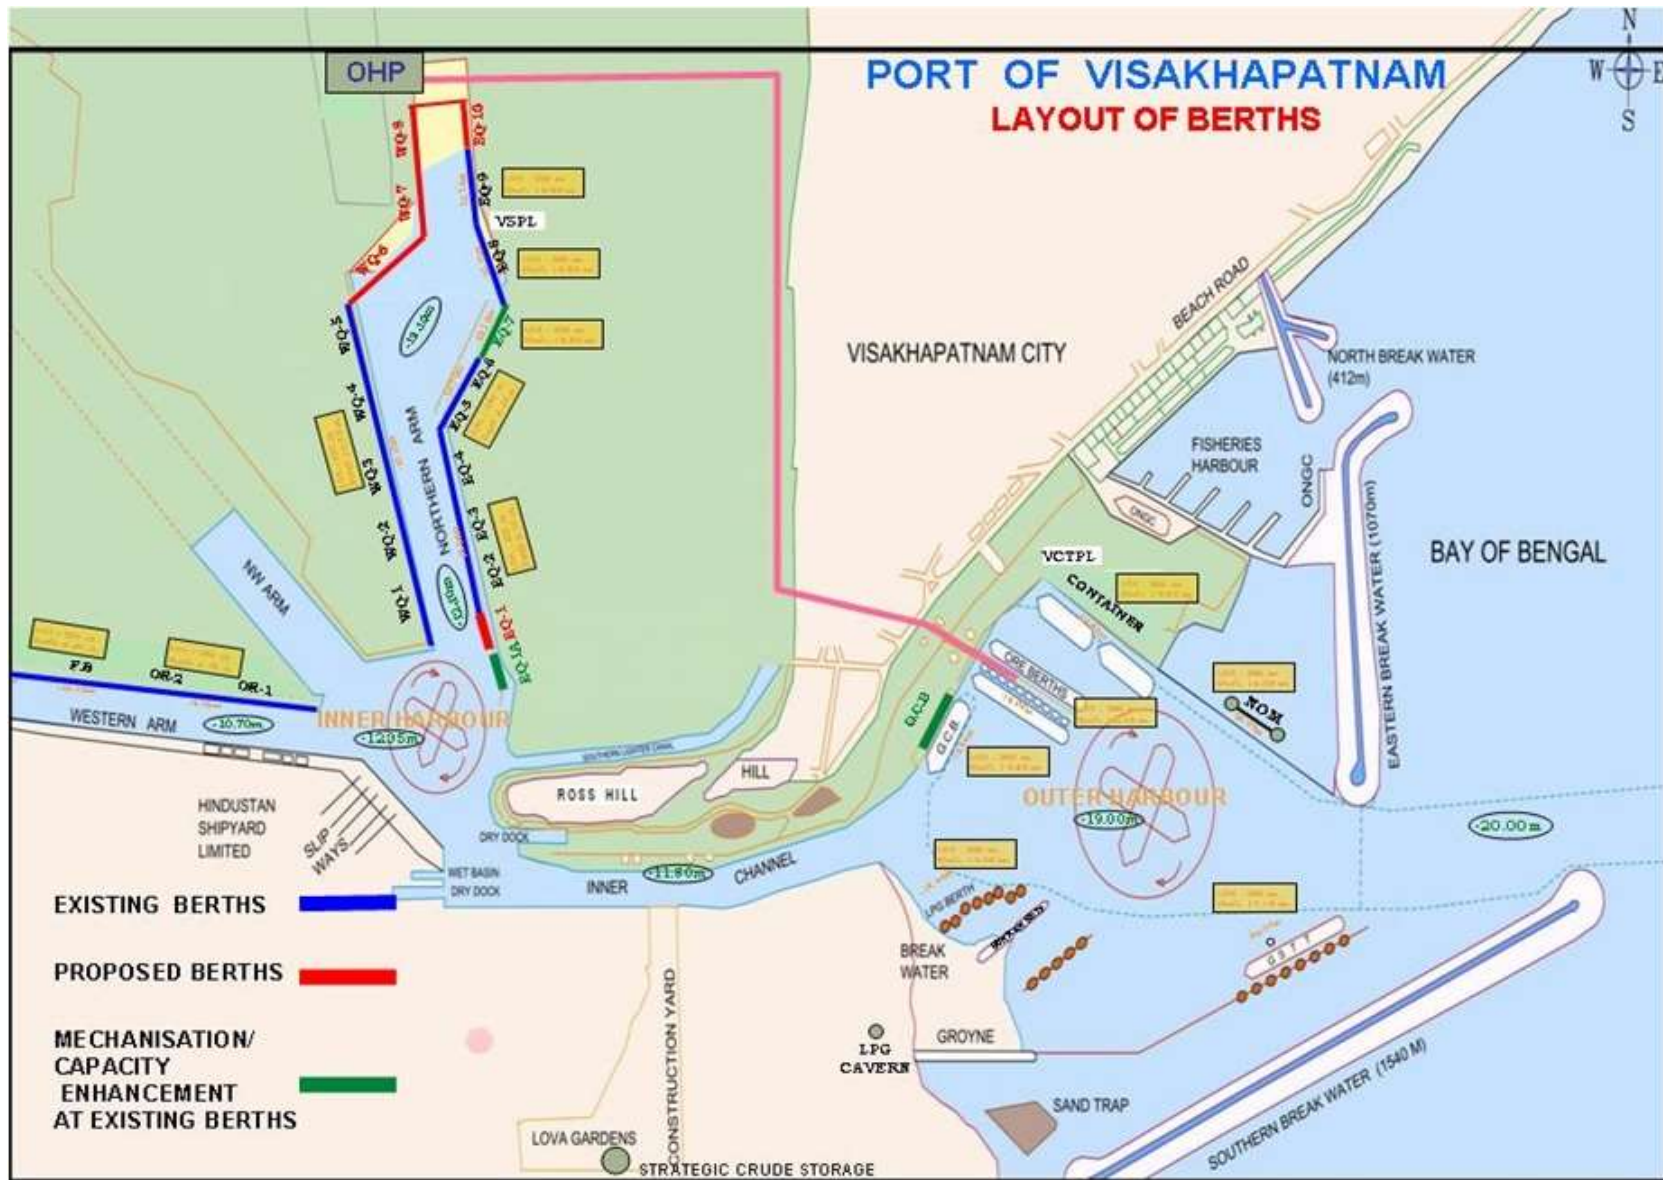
Layout of Existing and Proposed Berths in Visakhapatnam Port
